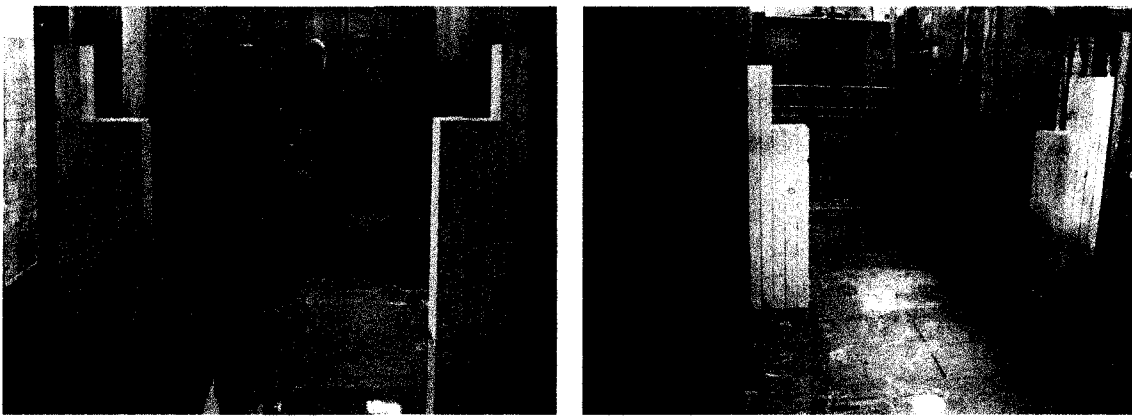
Wooden logs installed as constrictions, upstream of the structure: (a) upstream view; (b) downstream view.
